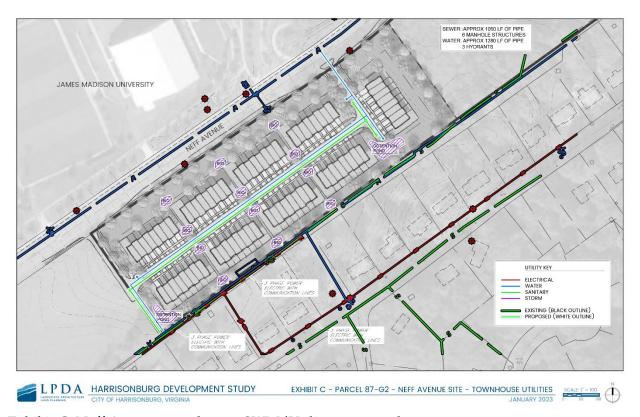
Exhibit C: Neff Avenue townhomes SWM/Utility concept plan
